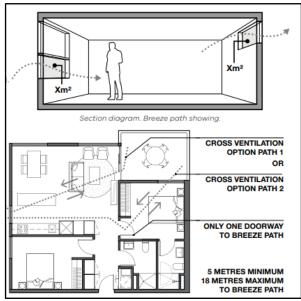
Examples of apartment design with consideration to cross ventilation (Image source: Apartment Design Guidelines for Victoria)
